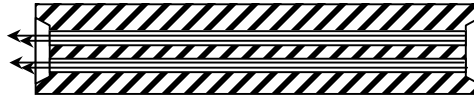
A post-tensioned pre-stressed concrete slab. Tension wires are passed through the tubes and are locked into place at the free end and the slab is placed in compression.
